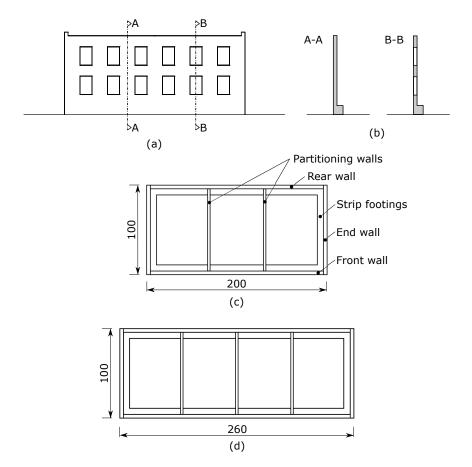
Building configuration: (a) front view of 200 mm long building, (b) cross-sections of the front façade only (see Fig. 1f), (c) plan view of 200 mm long building and (d) plan view of 260 mm long building. Dimensions in mm.
